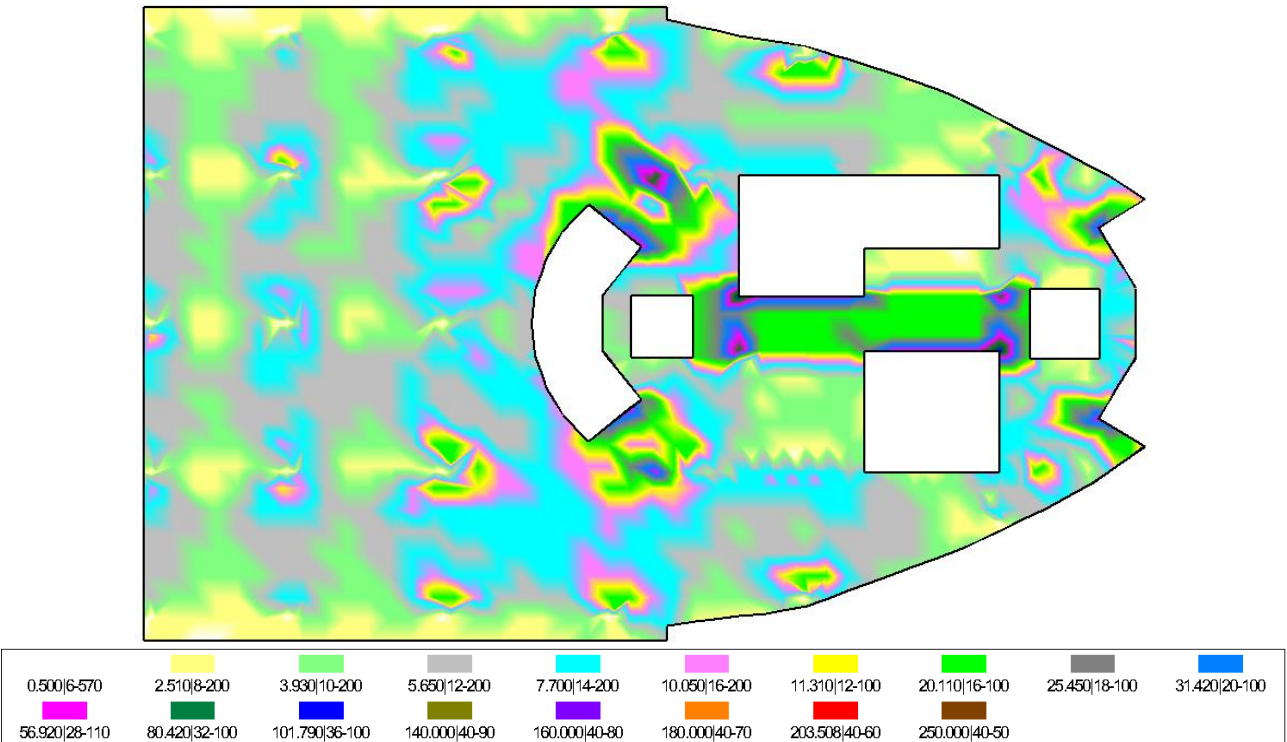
Reinforcement of the floor slab of the western tower at +42.80 m. Lower longitudinal reinforcement in the direction of the axis S, cm²/m [15]
